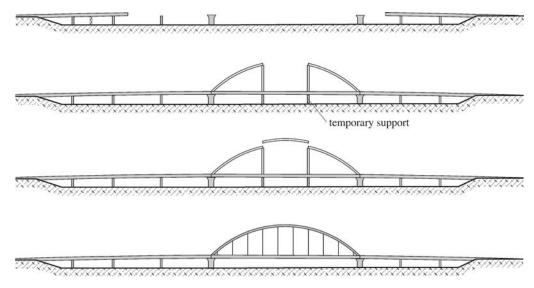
Example of launching the deck, followed by erection of the arches.
